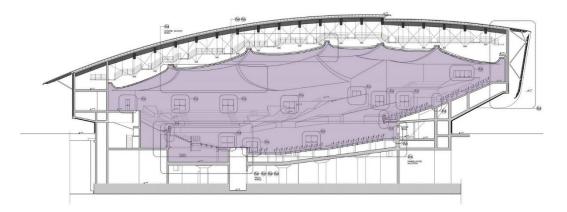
Section drawing of the Auditorium Parco della Musica
